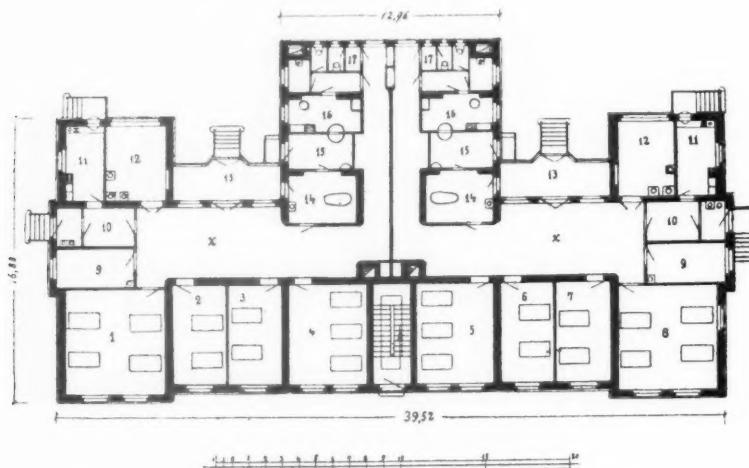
GROUND FLOOR PLAN OF PAVILION FOR INFECTIOUS DISEASES,
